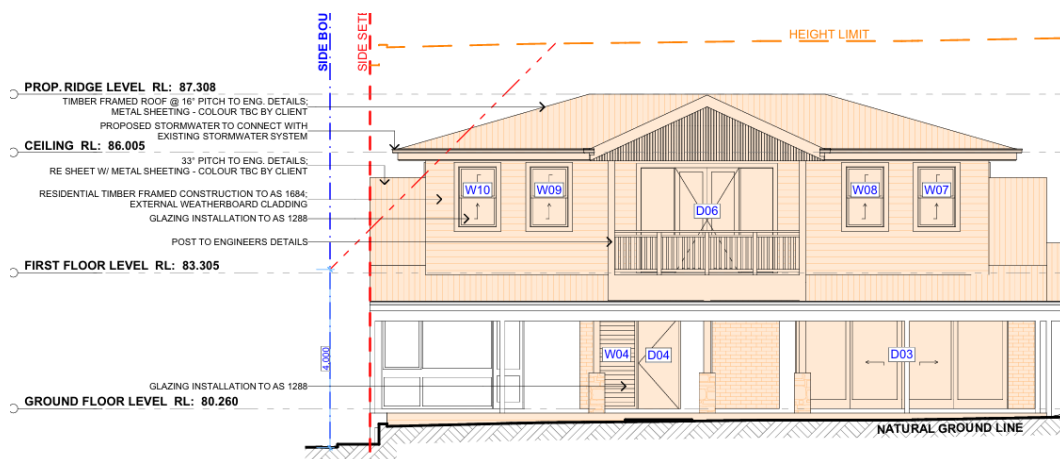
Extract from plans showing breach to side boundary envelope on the northern side of the dwelling
